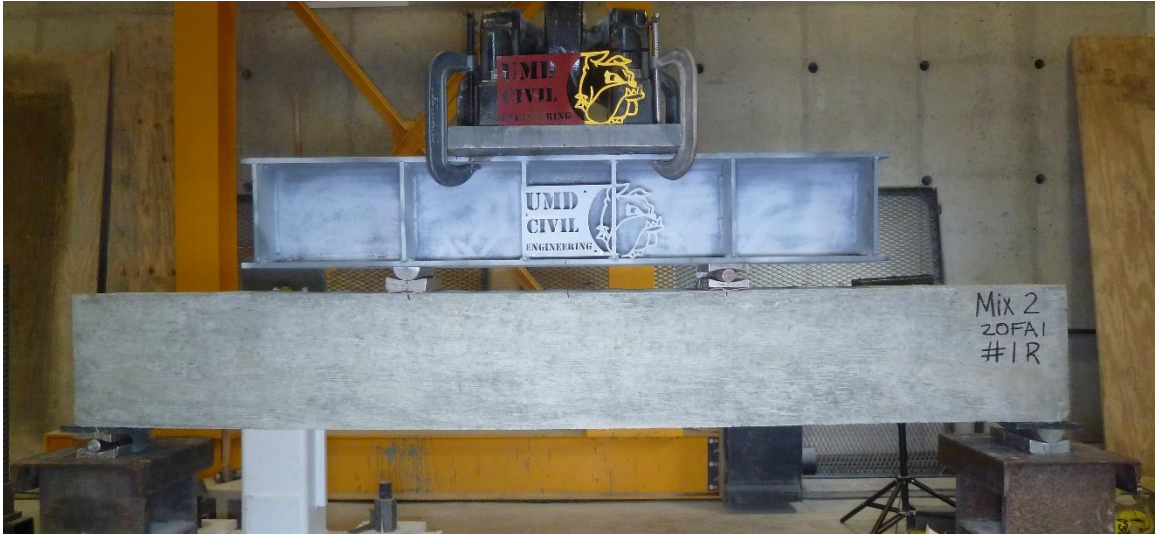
Mixture 2 (20FA1) beam #1R: concrete beam before testing.
